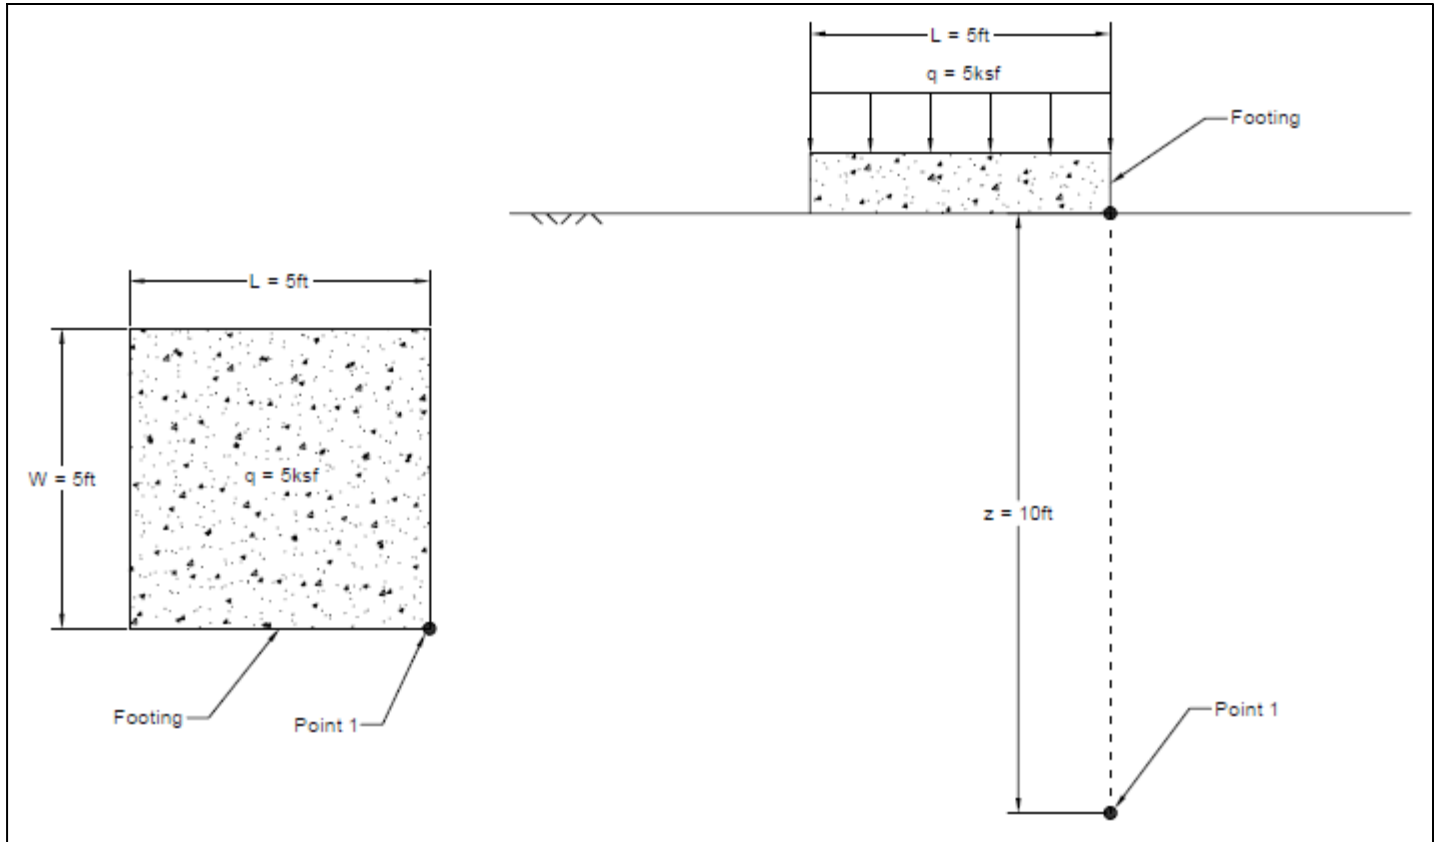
Stress Beneath Corner of Square Footing Diagram (Left - Plan View, Right - Cross Section)
